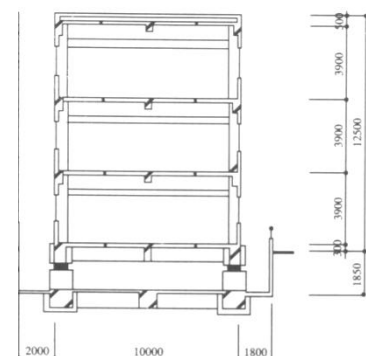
Vertical structural elevation of the base isolated laboratory building in Kobe
